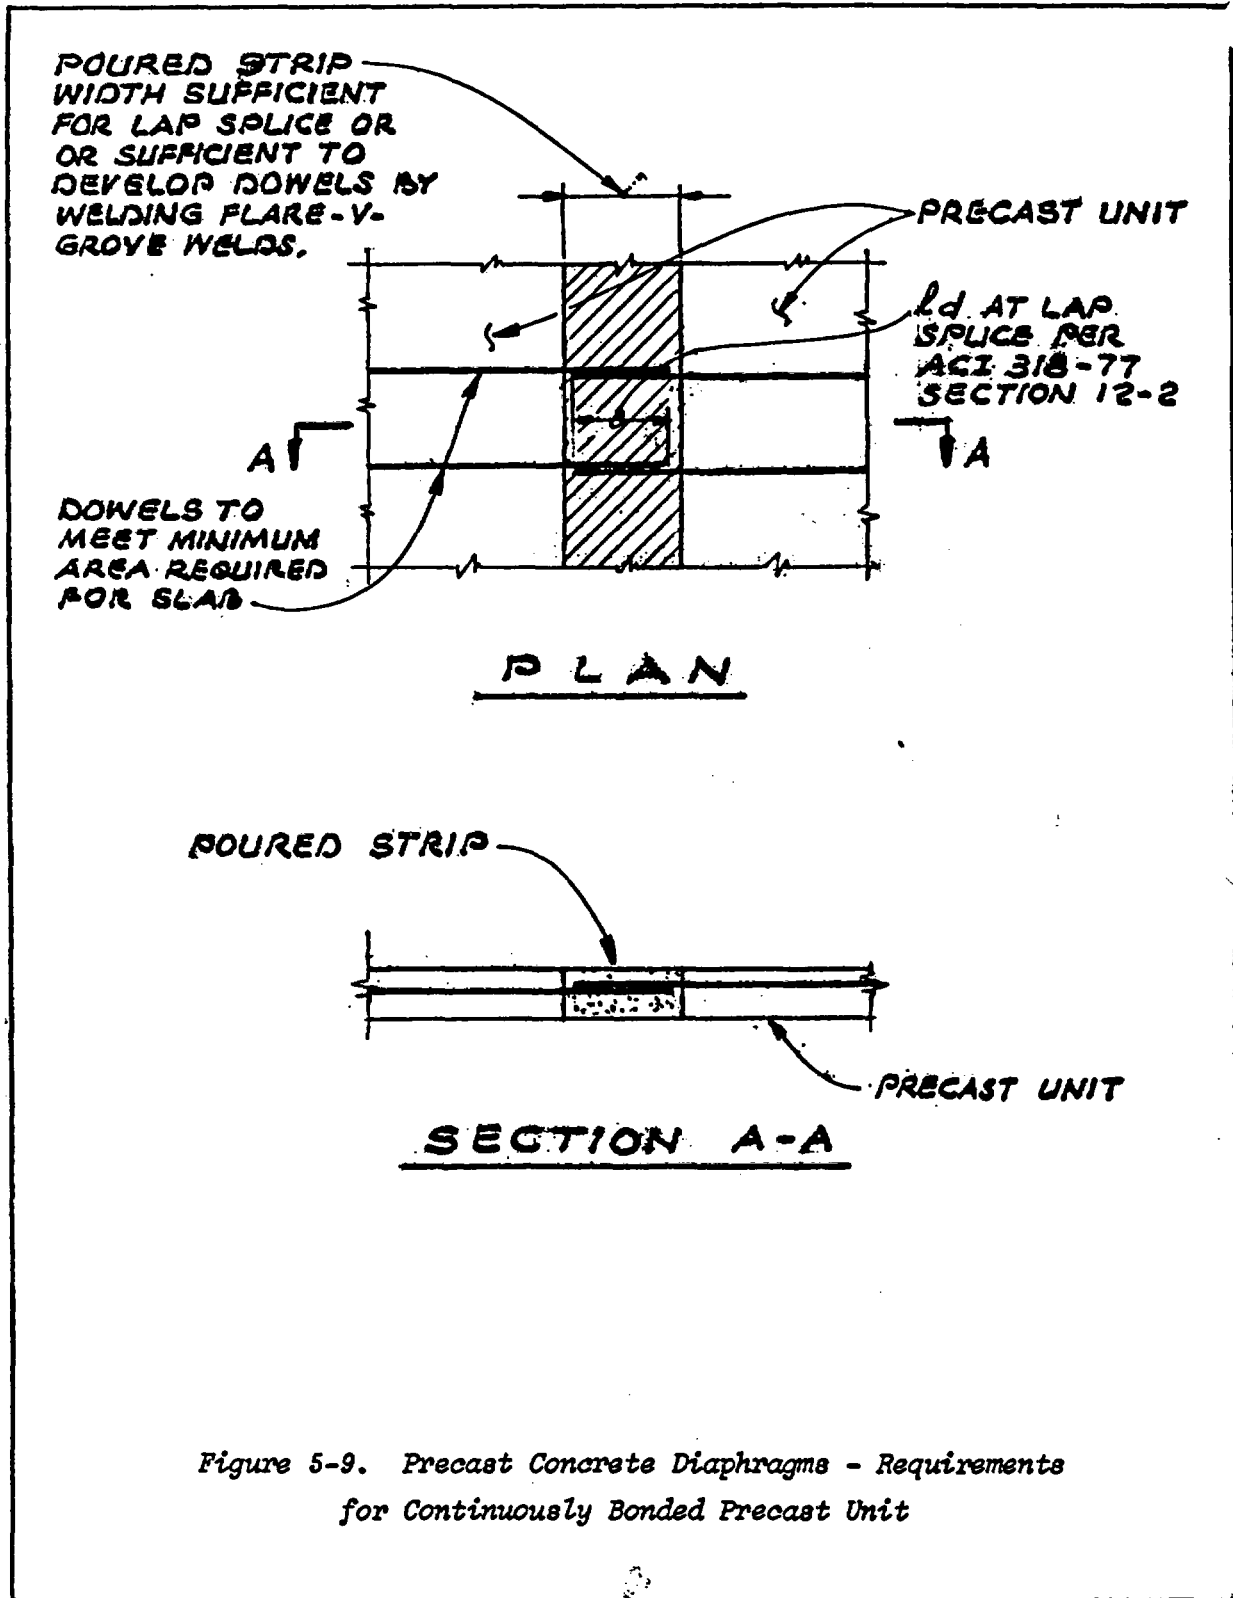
Precast Concrete Diaphragms - Requirements for Continuously Bonded Precast Unit
